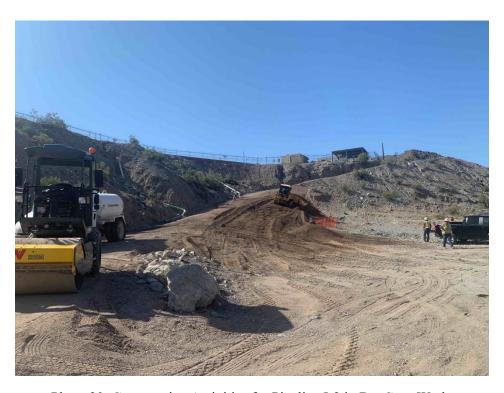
Construction Activities for Pipeline I-2 in Bat Cave Wash.
